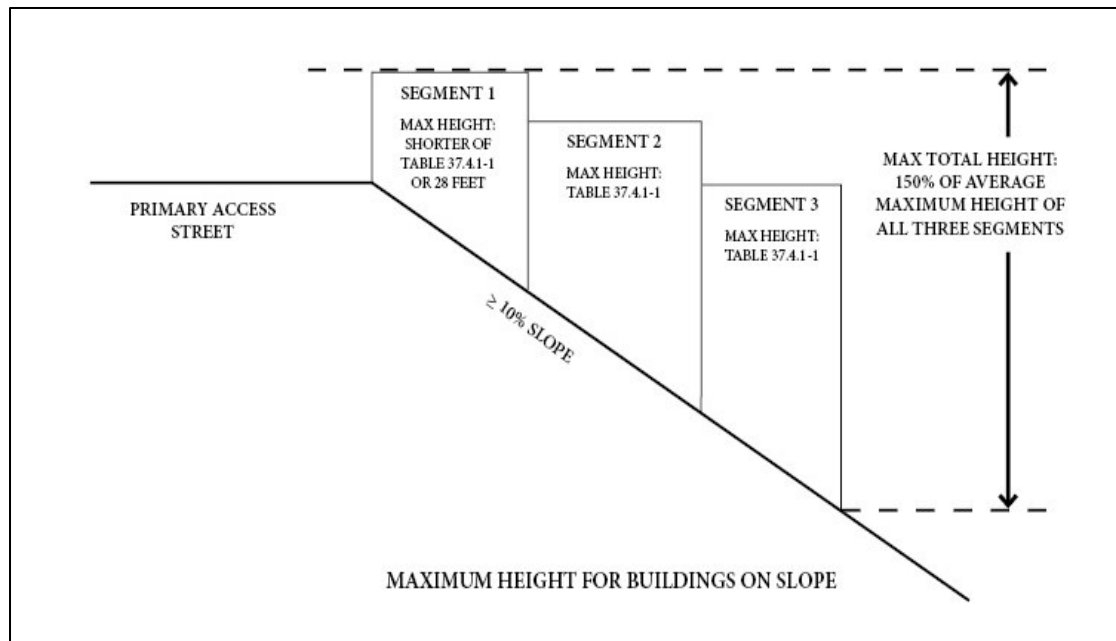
A: Maximum Height for Buildings on Slope
